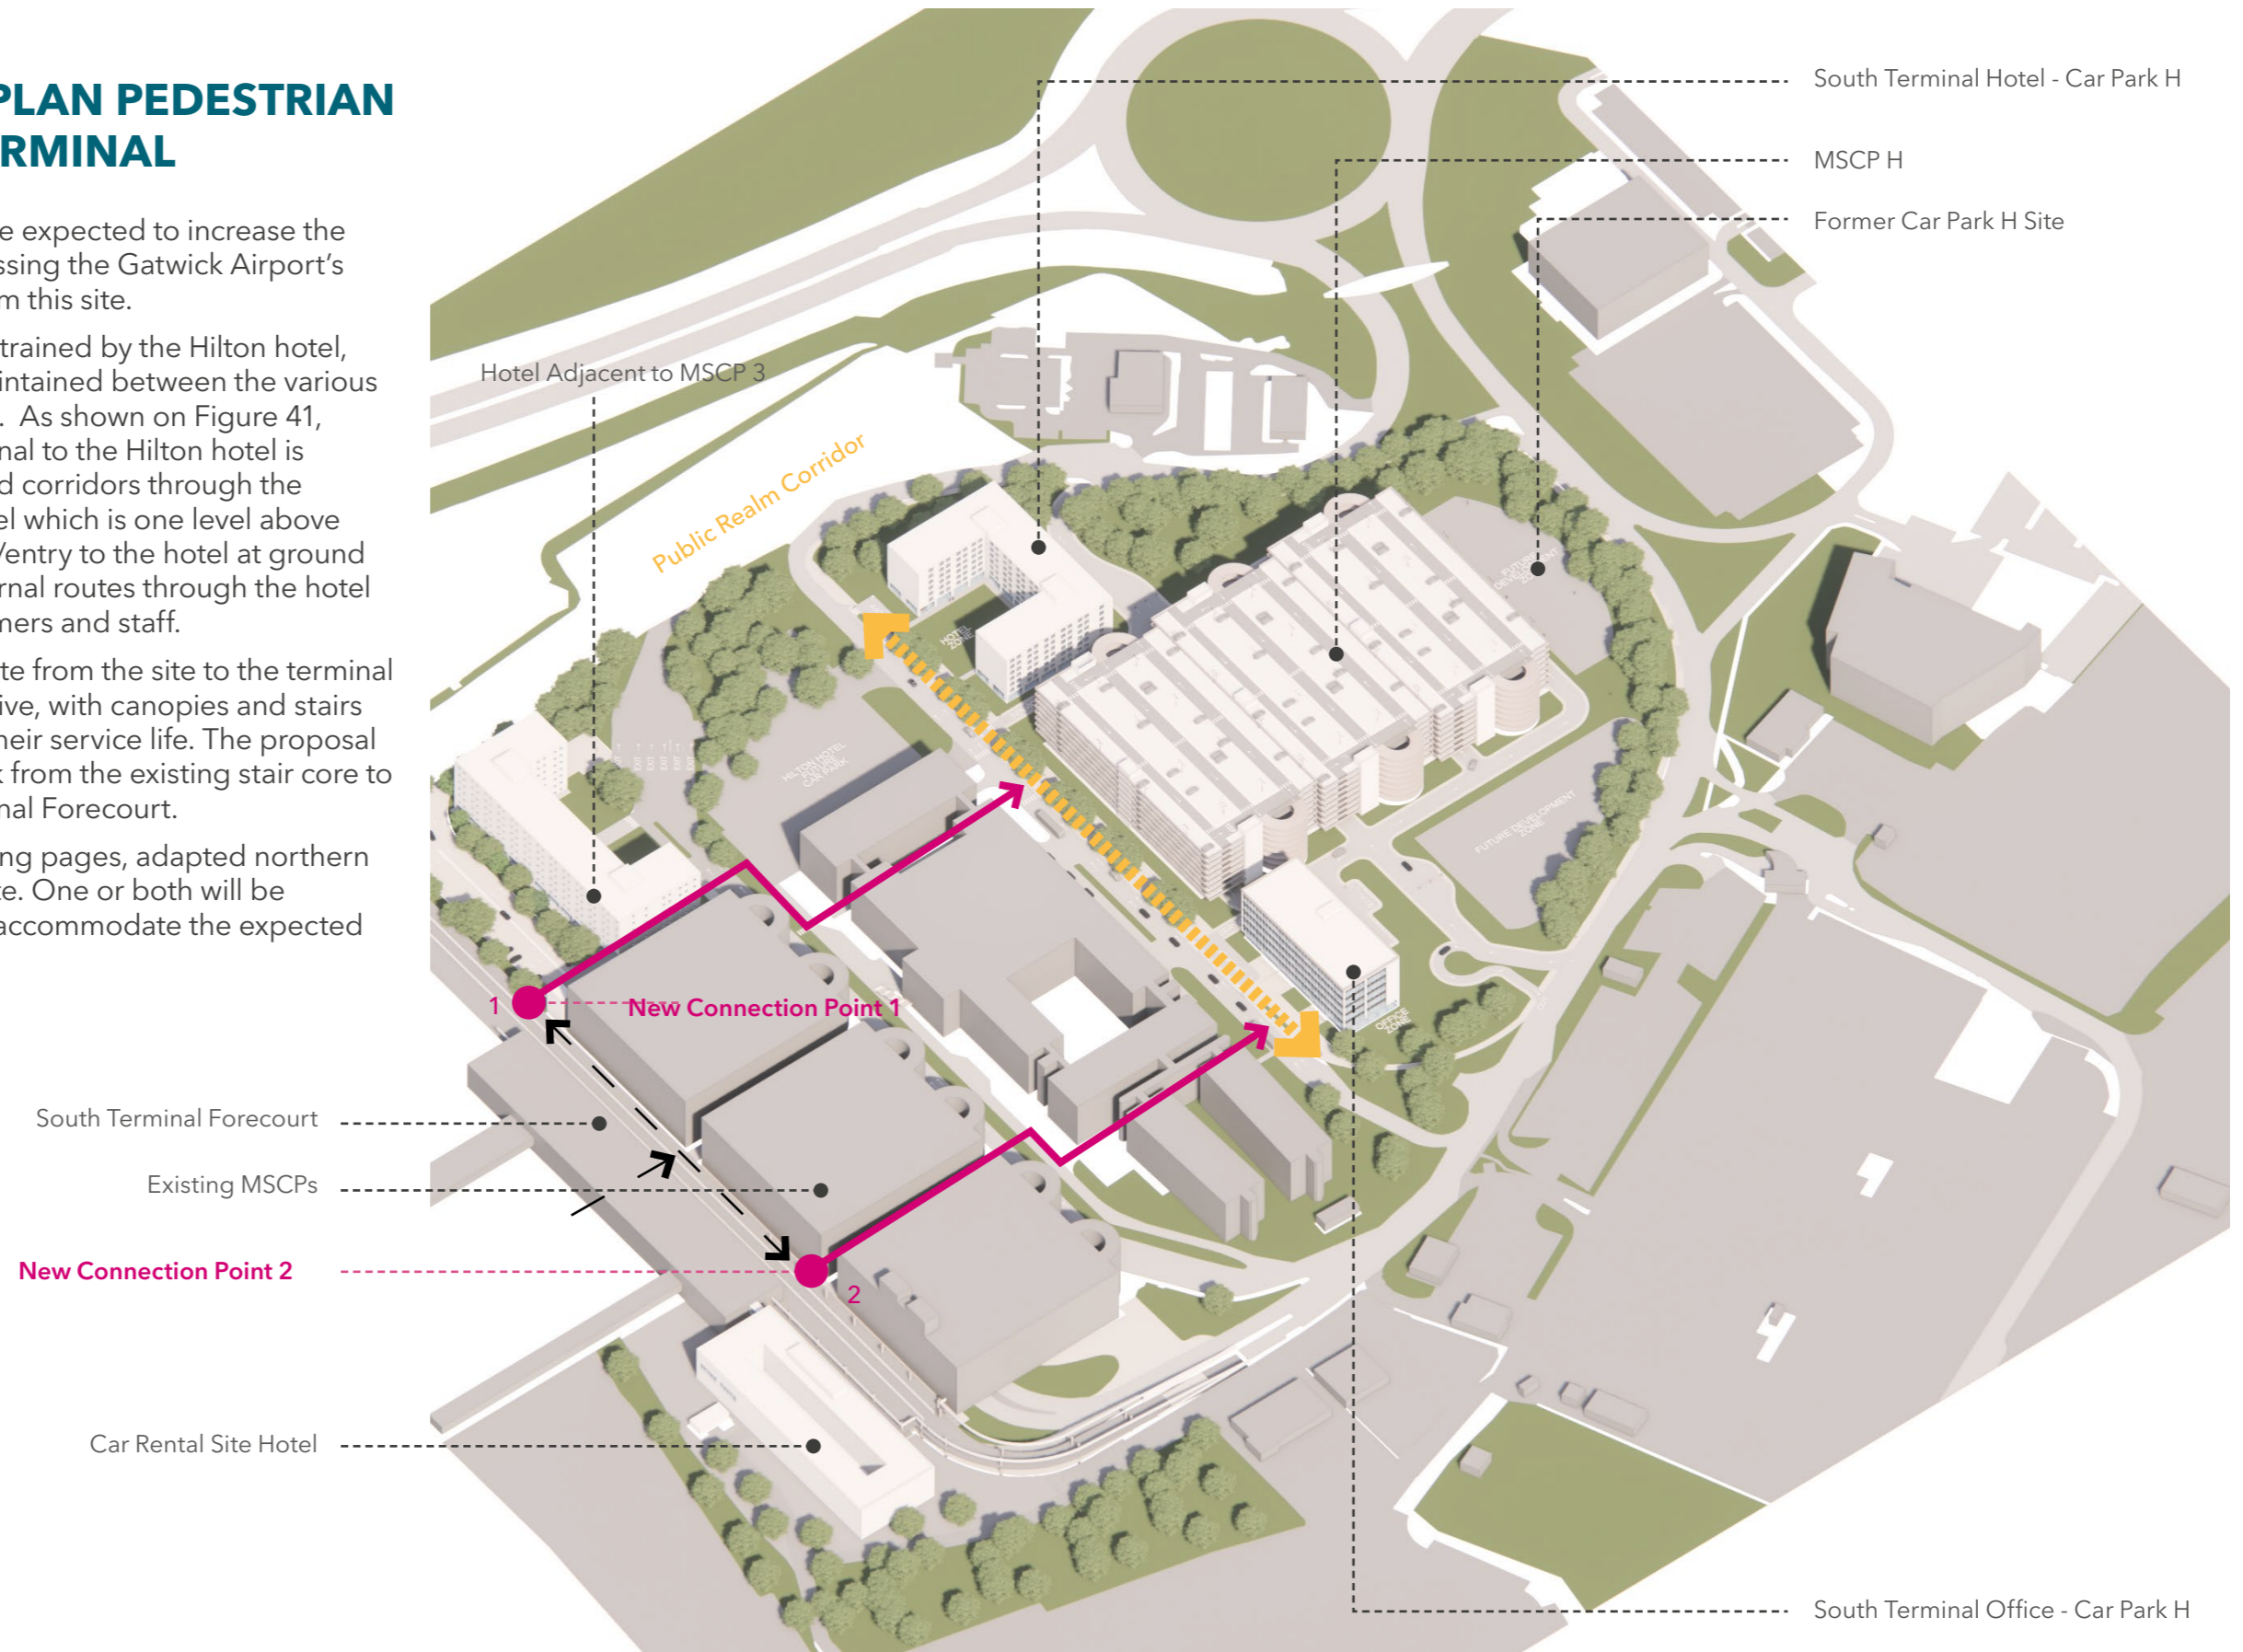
Proposed Mini Masterplan Access Routes 3D - Axonometric
